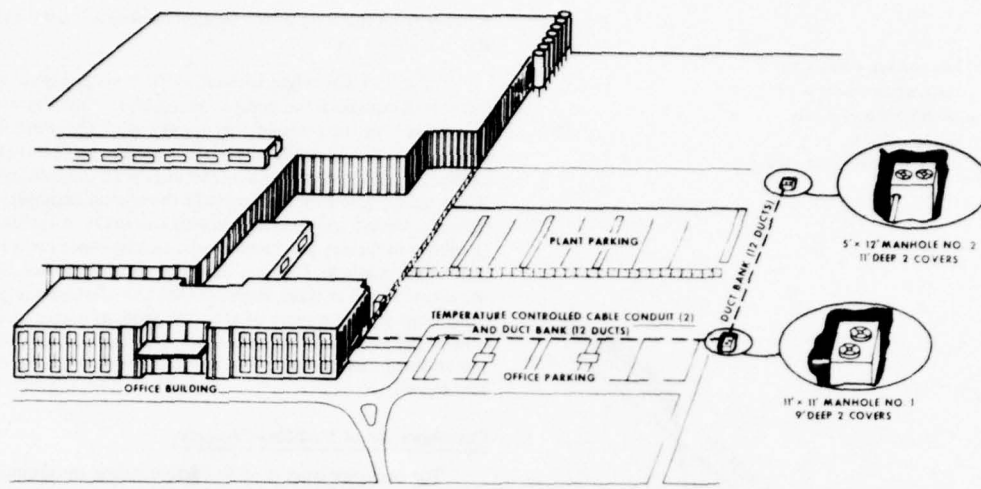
BTL (Atlanta) Underground Cable Conduit and Duct Facility
